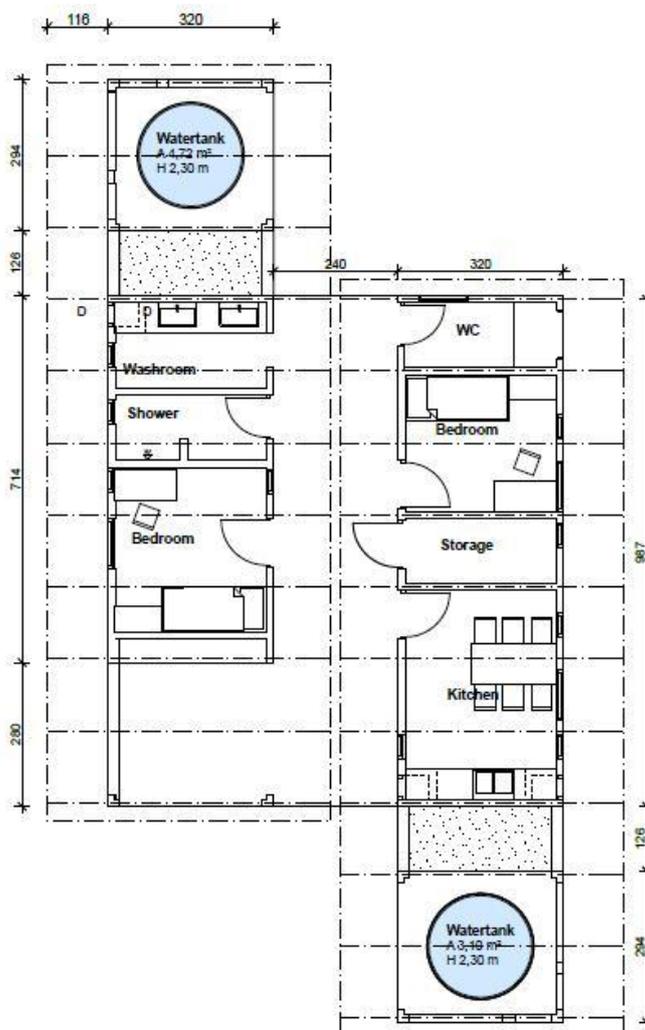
The picture shows the floor plan of the prototype house (Asante, 2014).
